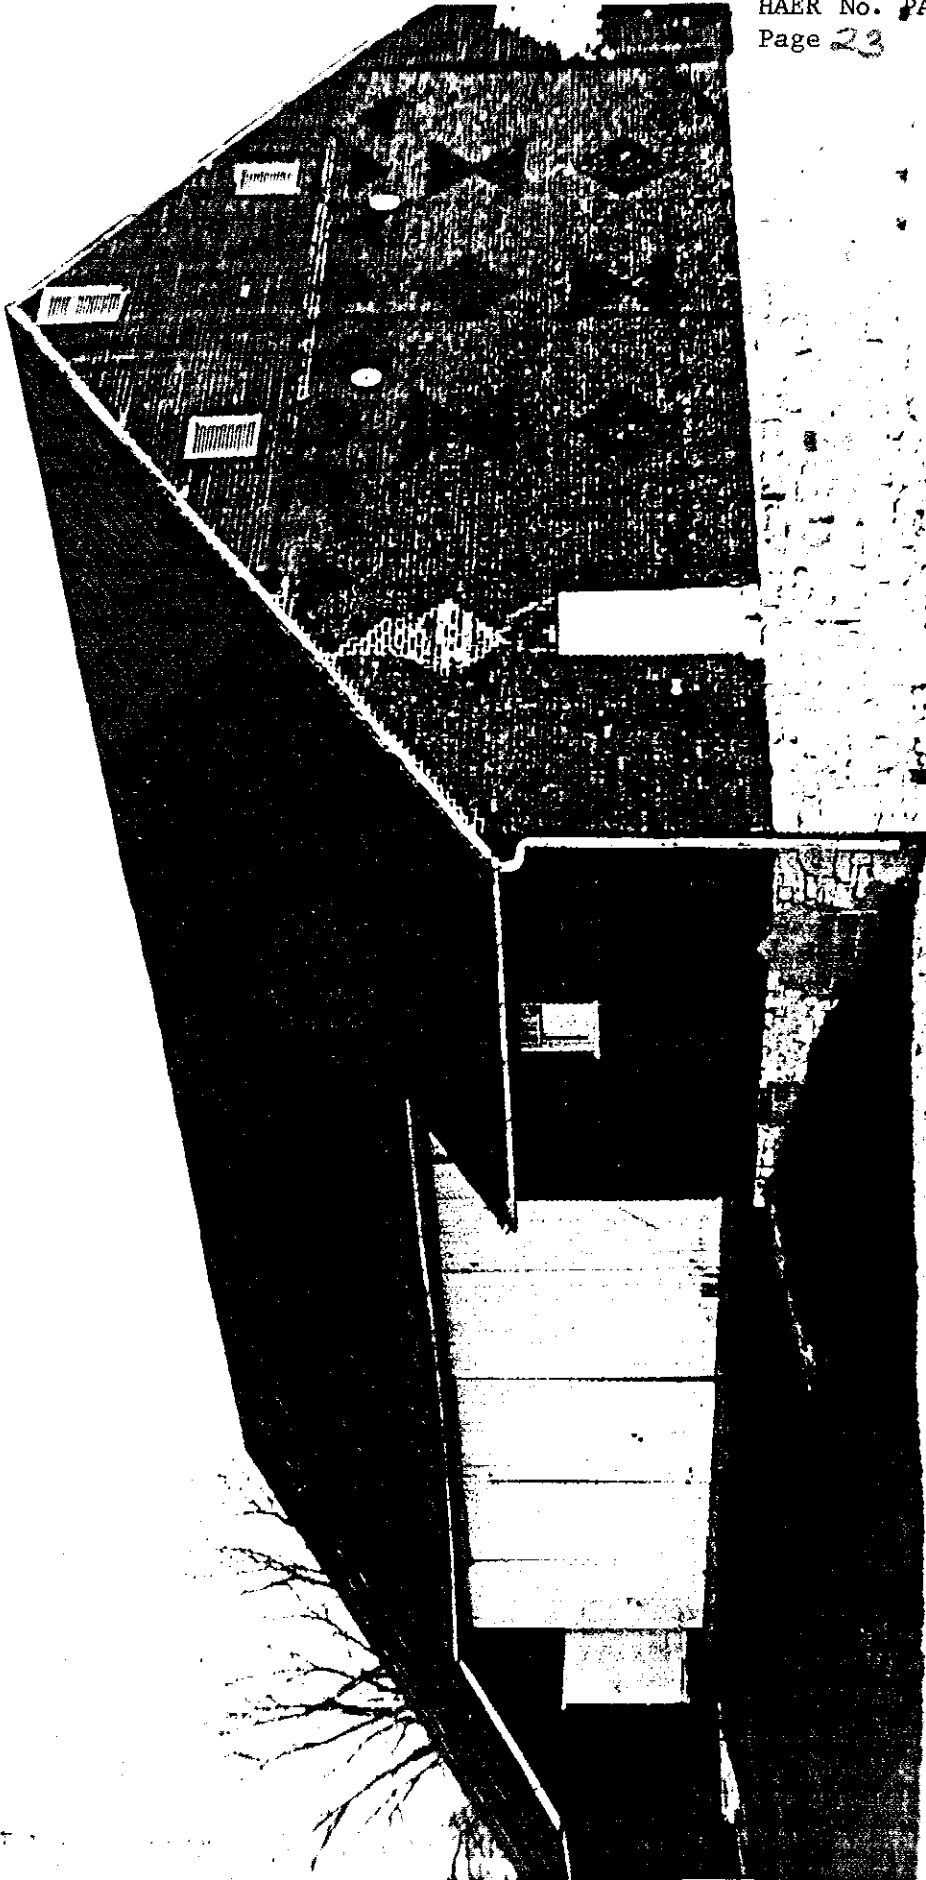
Finley Barn (Building 507). View of southwest brick end wall with patterned ventilating holes. The barn was built c. 1848. (Source: Field inventory photograph, David G. Buchanan, Building Technology, Inc., 1982)
